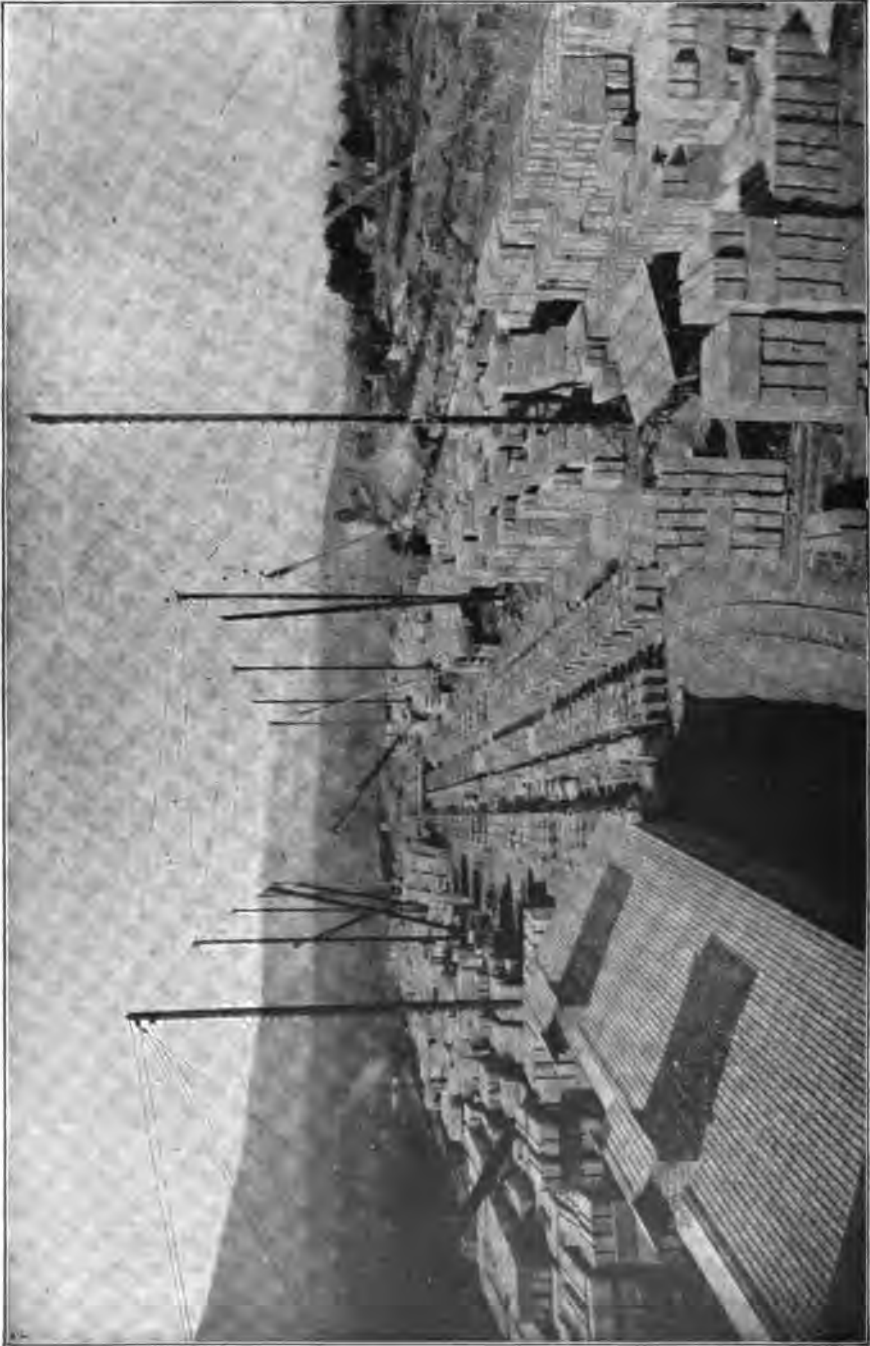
Olive Bridge Dam, Blockyard, Showing the Ten Derricks and Storage of Blocks for Dam. Blocks were Cast in Center from Traveling Platform over Form.
